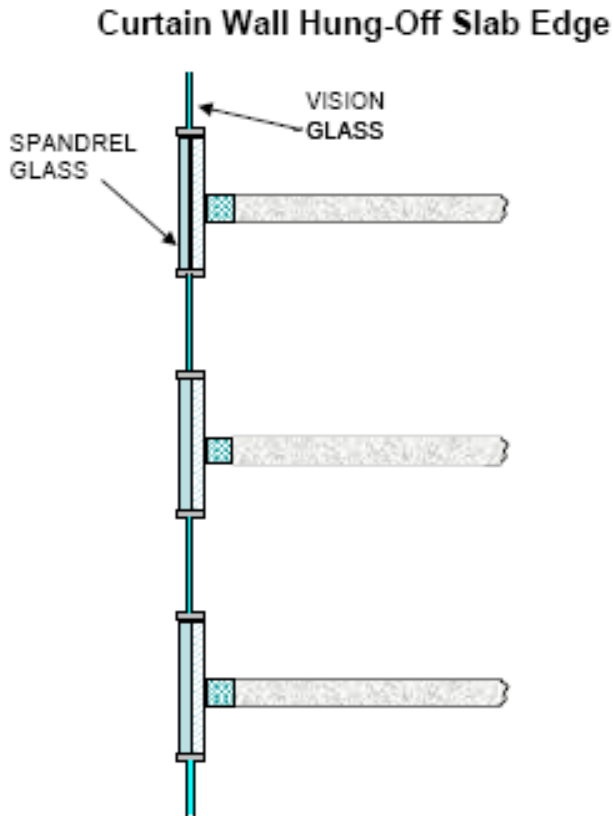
Curtain wall hung-off Slab edge. (Courtesy of Aon Fire Protection Engineering)
